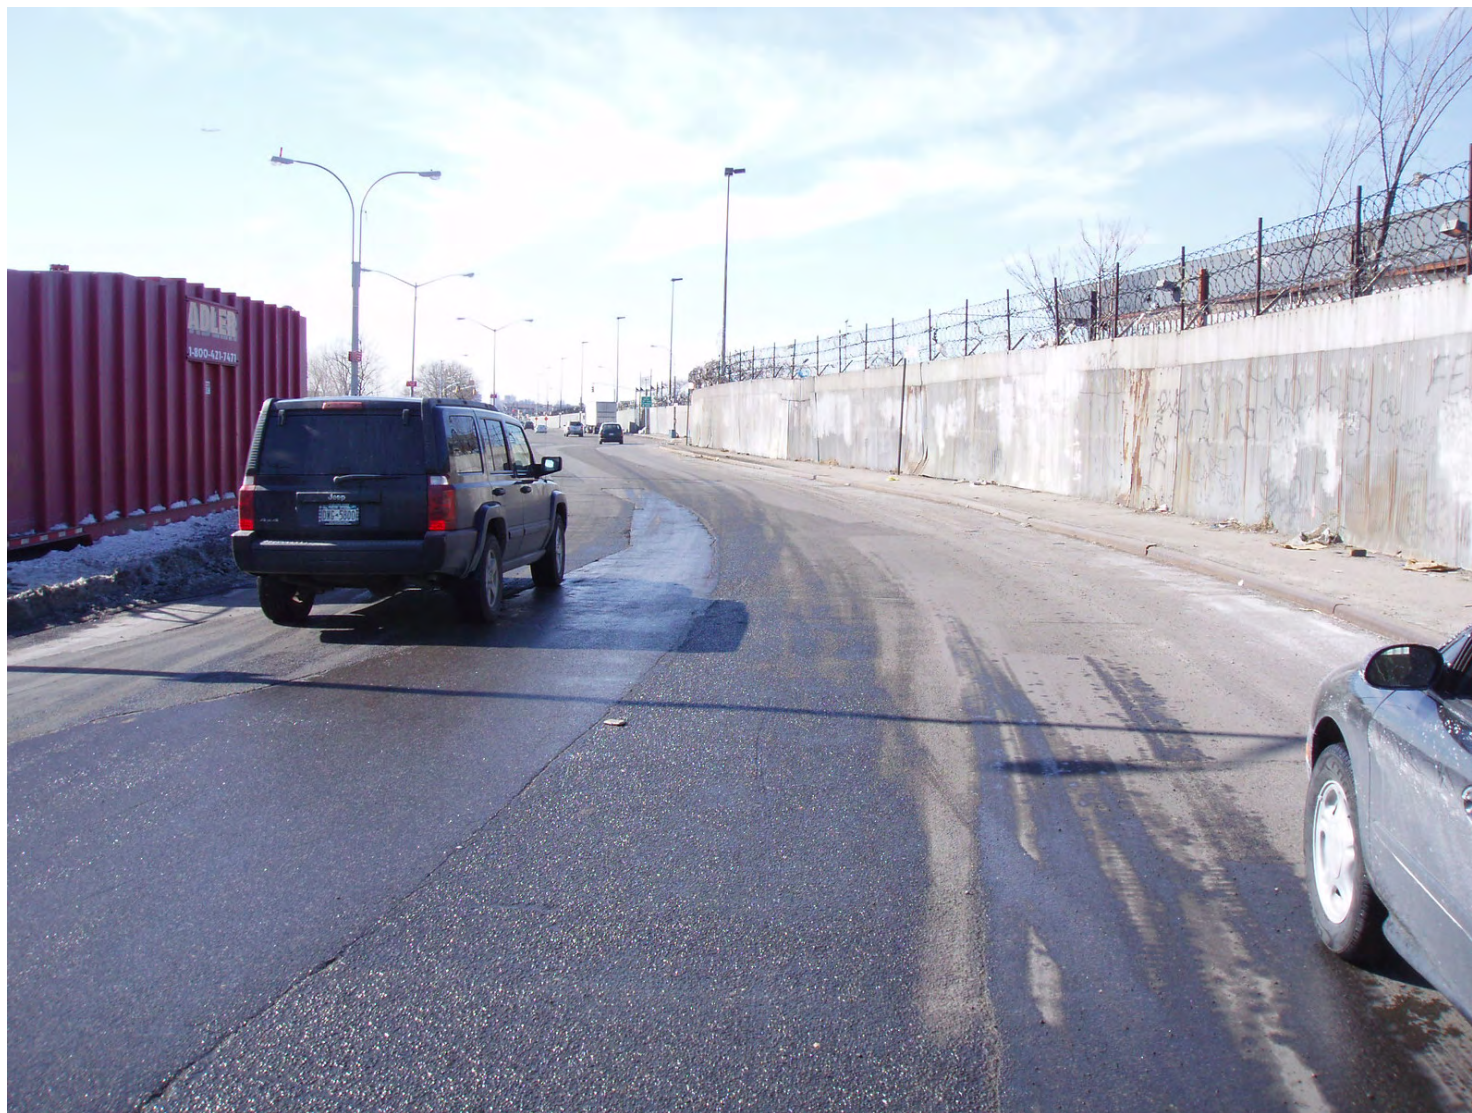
Southern terminus of Perimeter Site at southeast corner of intersection with Food Center Drive and Farragut Street (looking northeast)
